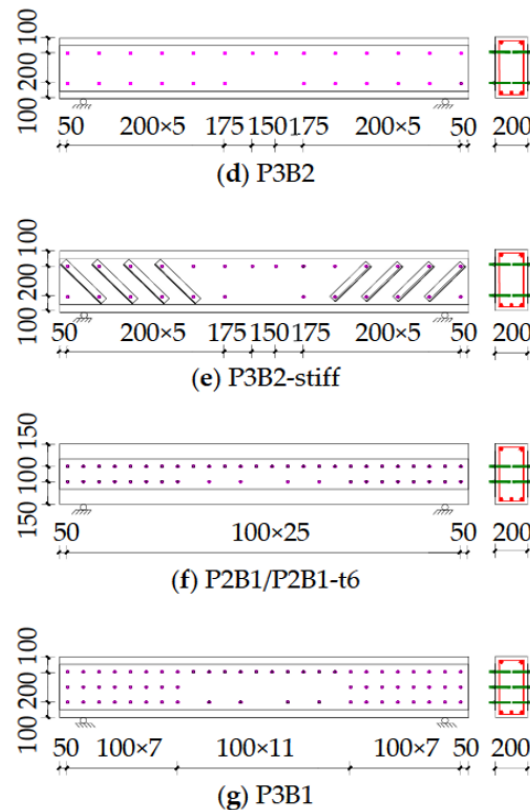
Variants of strengthening reinforced concrete beam specimens using side steel plates and bolted connections (BSP method) (dimensions in mm) for investigating the shear strength of their cross-sections in the study by Xin Liu et al. (2018) [28].
